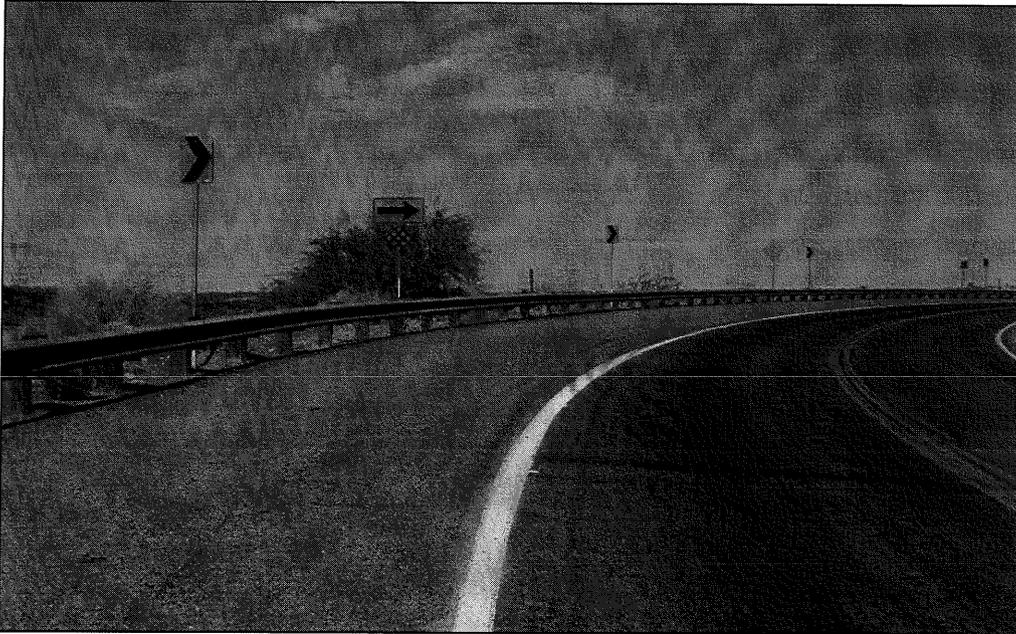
Photograph of guardrail Road Feature 2 on Road Segment 3, AZ FF:9:17(ASM), facing northwest near the west end of Gillespie Dam Bridge.
